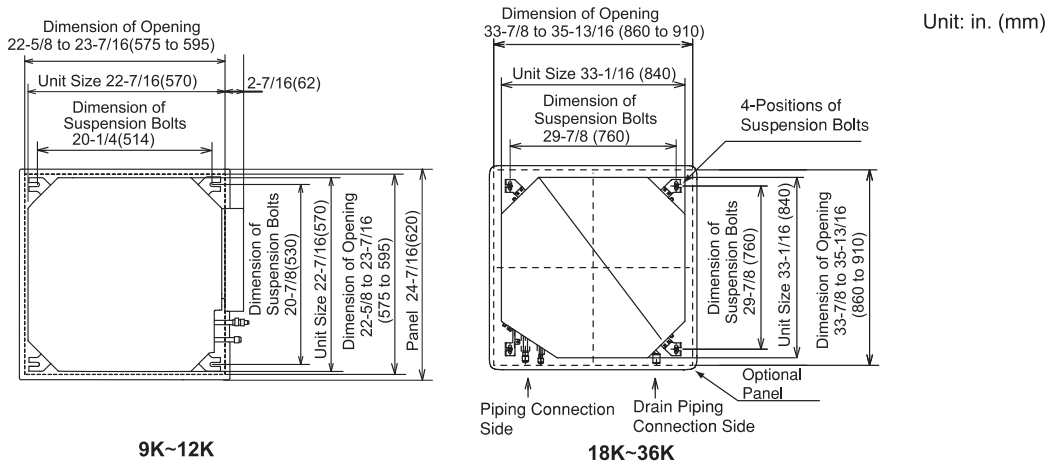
Opening of False Ceiling and Suspension Bolts
